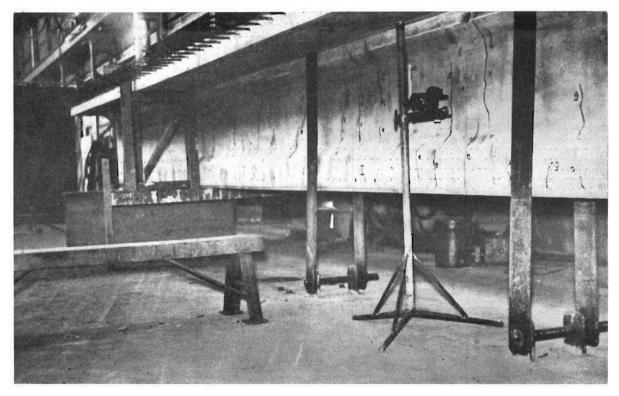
Load tests on 40 foot high strength reinforced concrete beam.
